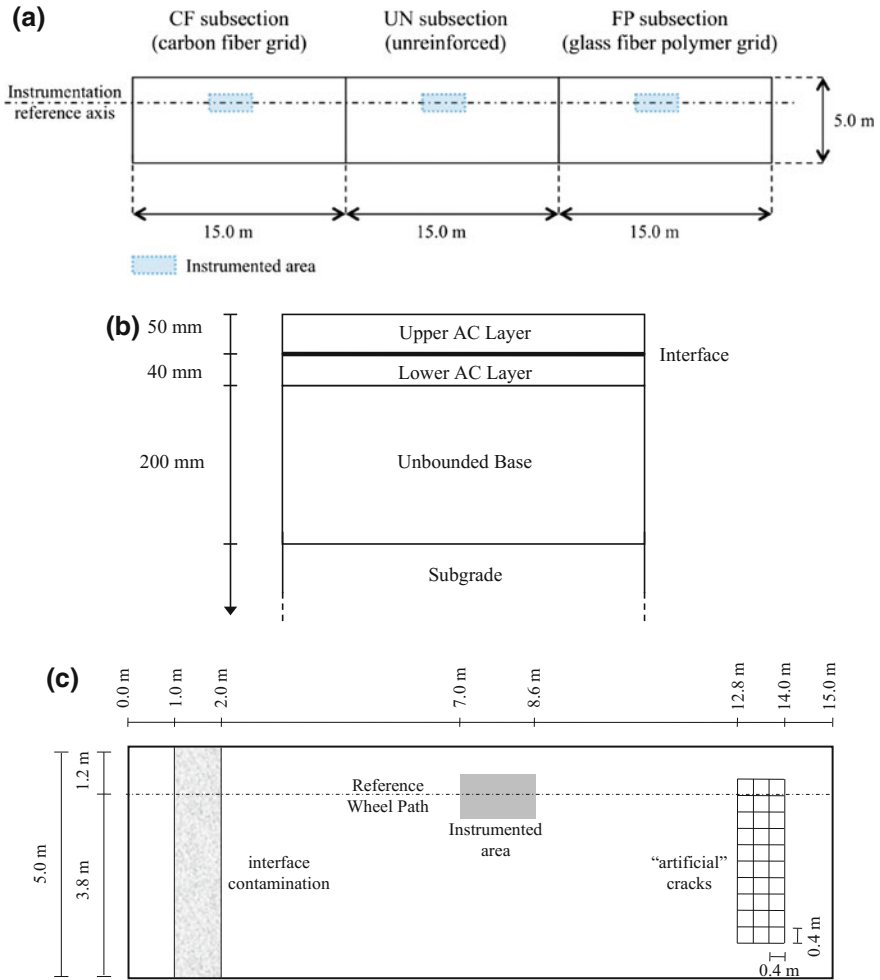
Instrumented Section B: a plan view; b cross section; c interface contamination and "artificial" cracks on the lower asphalt layer
